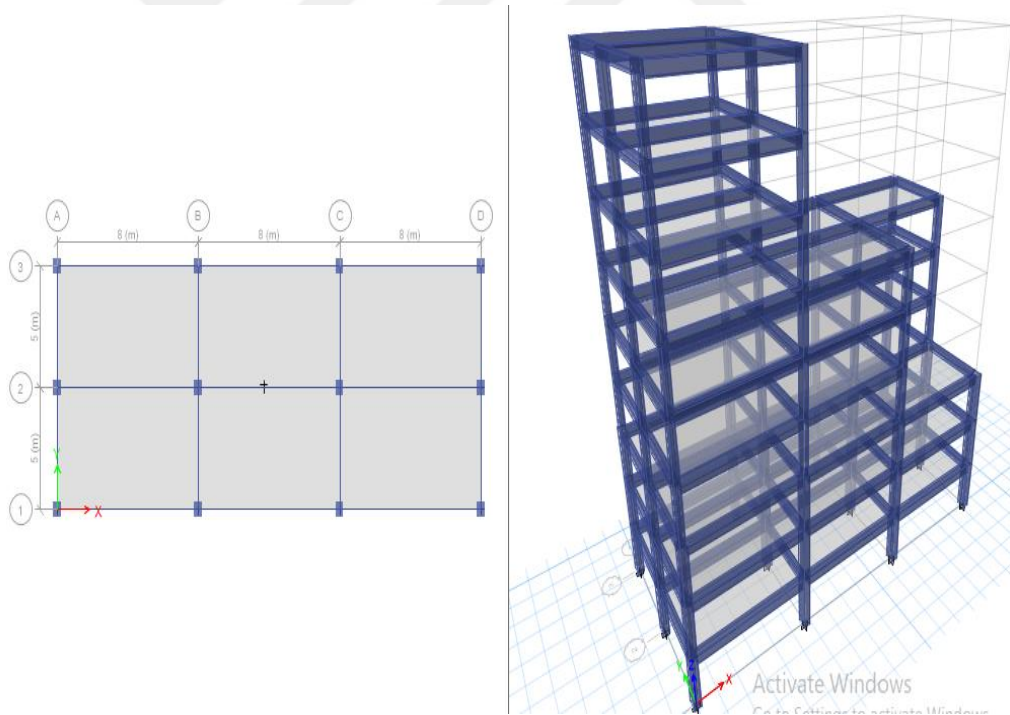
First to third story plan and 3D of 9 story irregular rcc building
